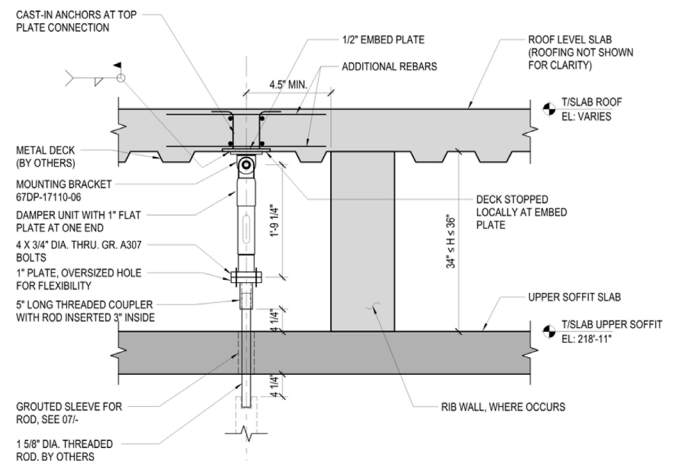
Vertical damper detail integrated with façade mullions inside the roof framing.
